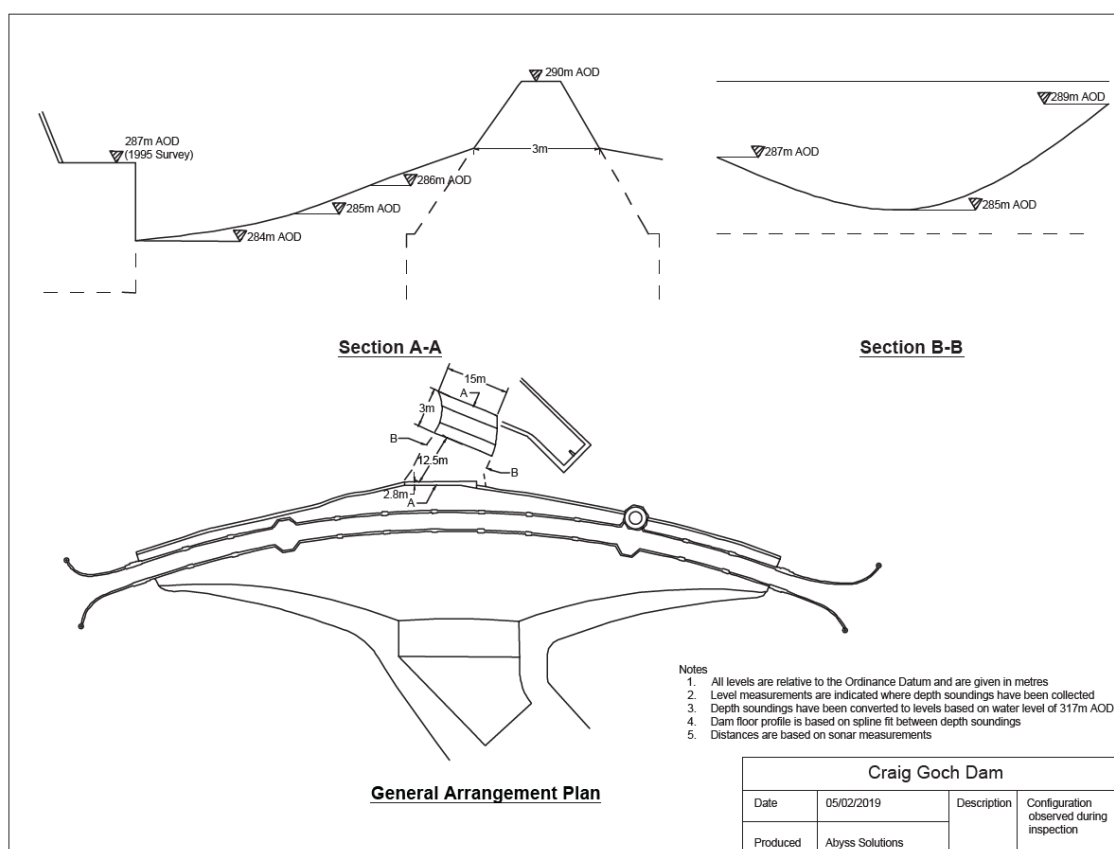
2D plan of dam showing general arrangement and details of coffer dam.
